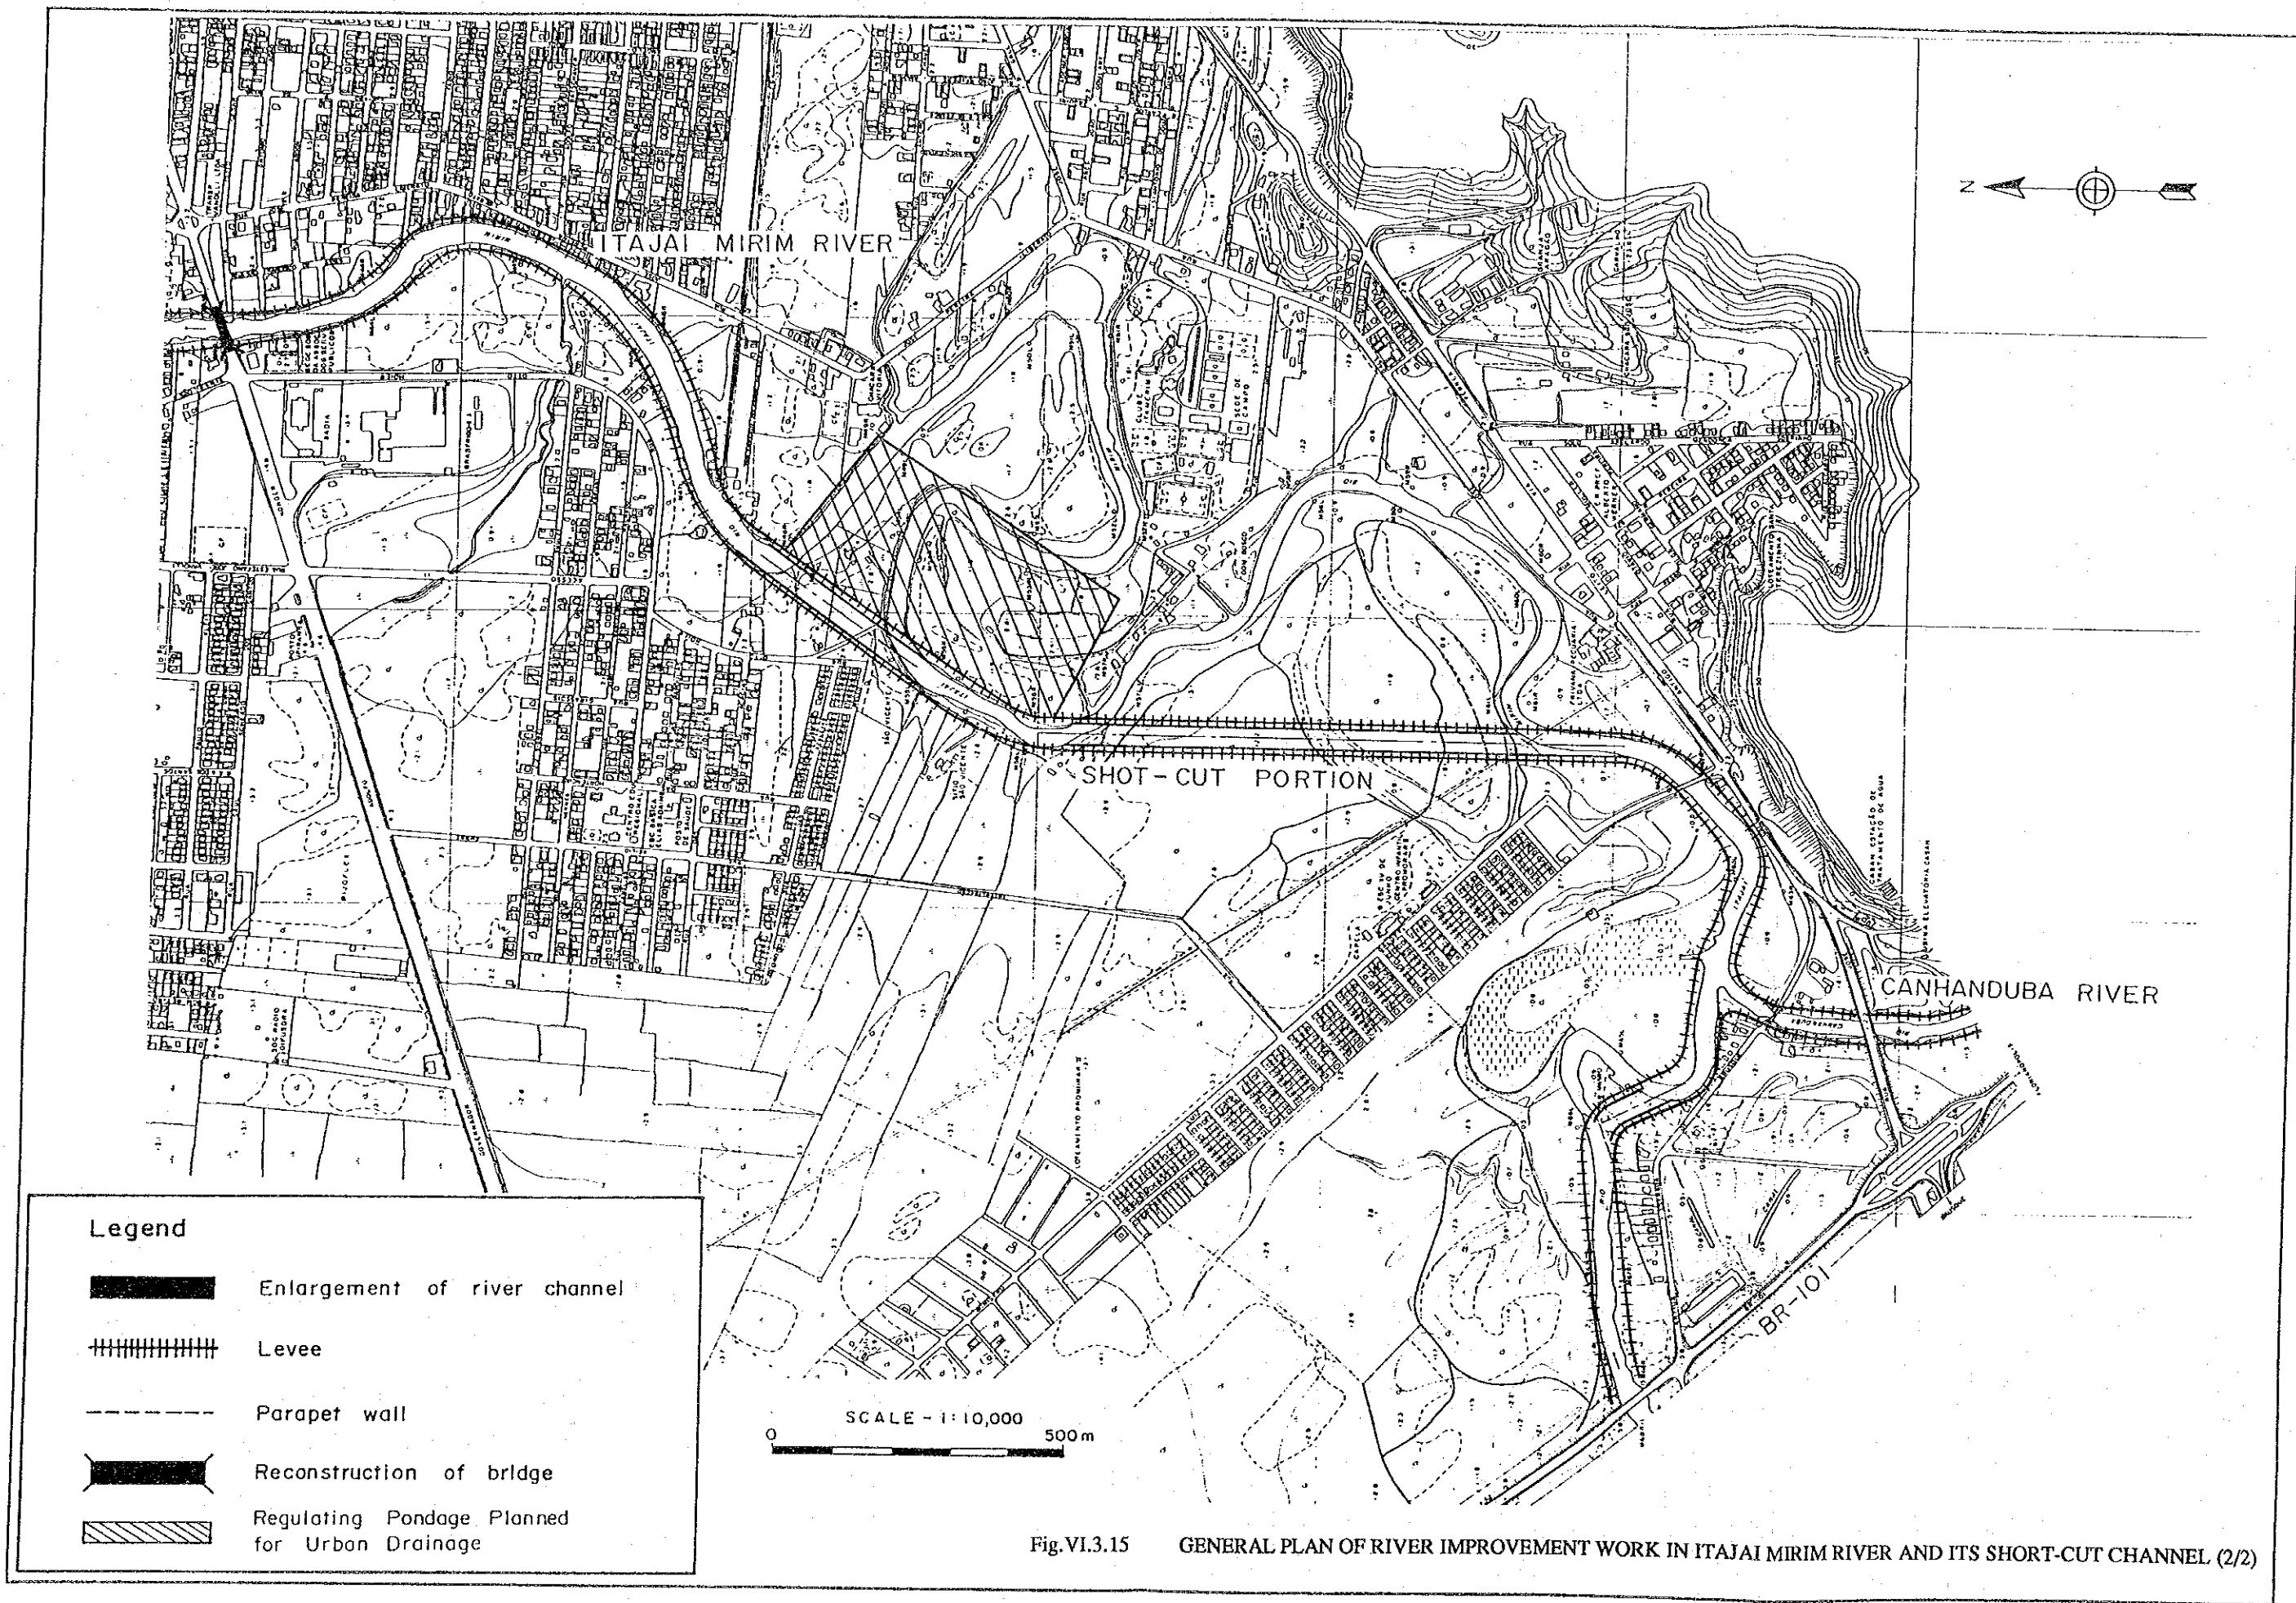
GENERAL PLAN OF RIVER IMPROVEMENT WORK IN ITAJAI MIRIM RIVER AND ITS SHORT-CUT CHANNEL (2/2)
